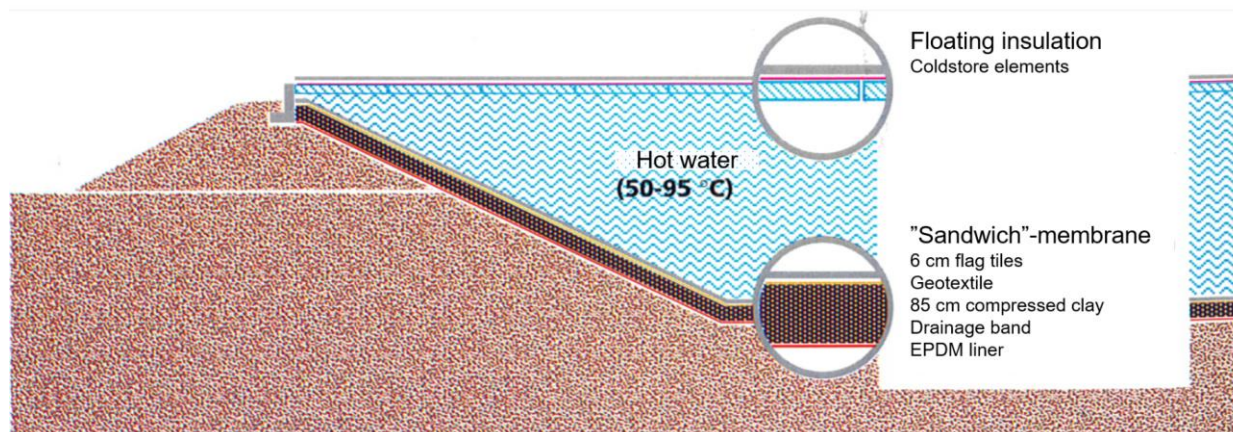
The storage construction in Ottruppgård (PlanEnergi)
